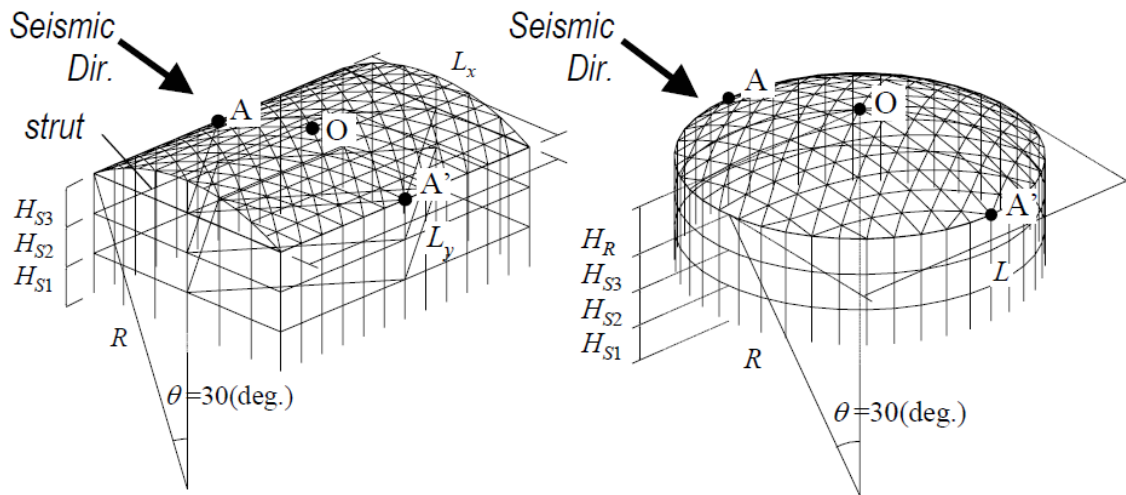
Cylindrical and Dome gridshell roof with a 3-storey substructure [32]
